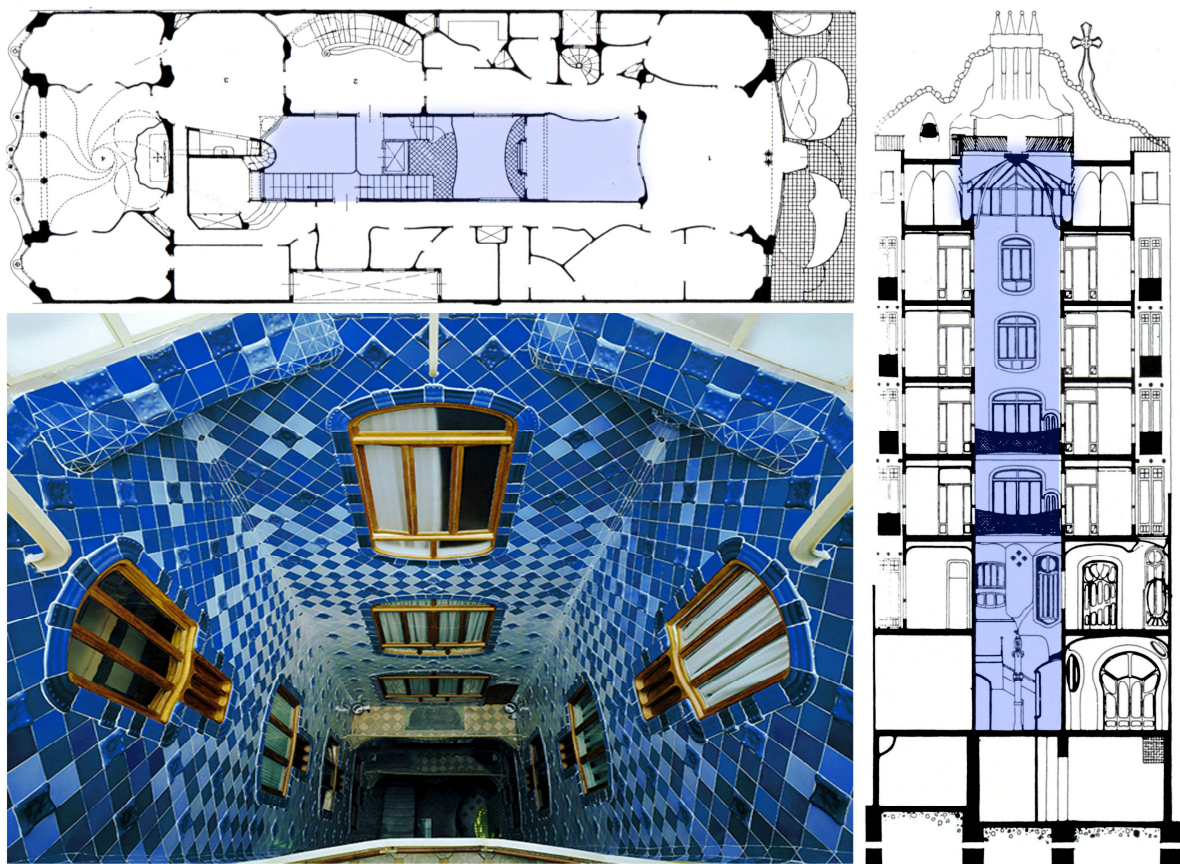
Batlló House. Plan of the principal floor and transverse section through rebuilt stairwell with the color blue is shown the patio, also in part visible in the photo.
